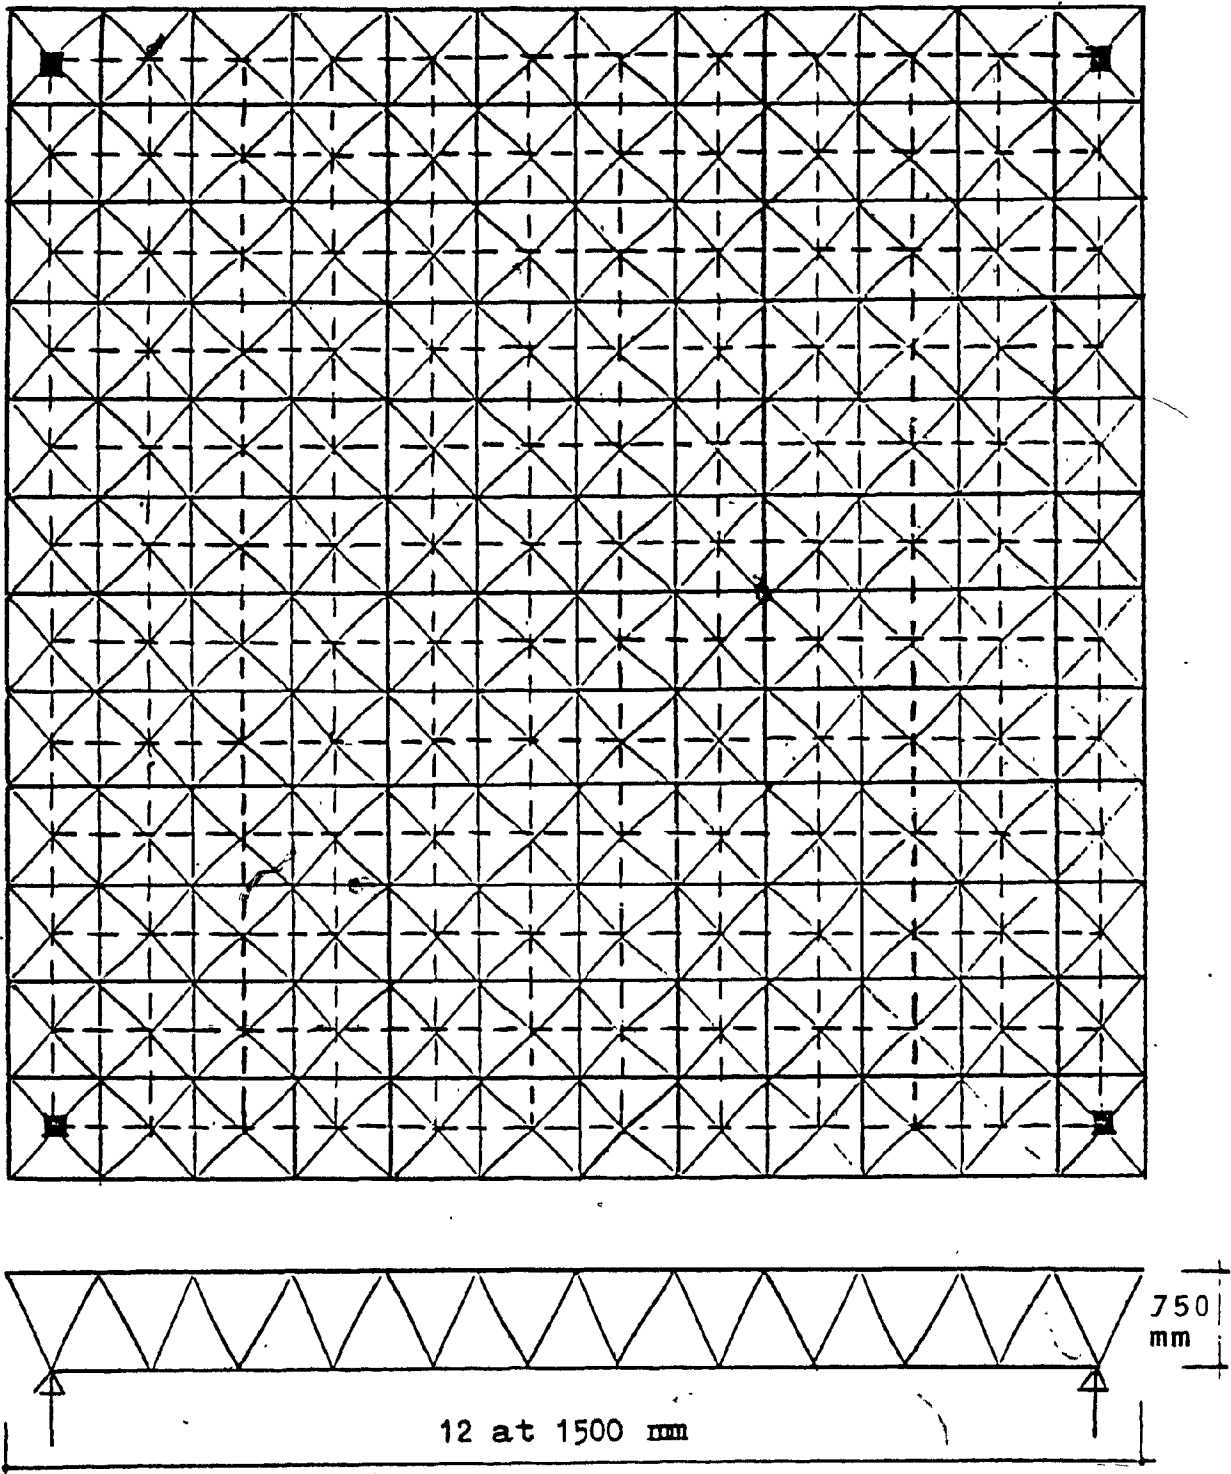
A12x12 BAY FOUR CORNER SUPPORTED ORTHOGONAL GRID SPACE TRUSS
